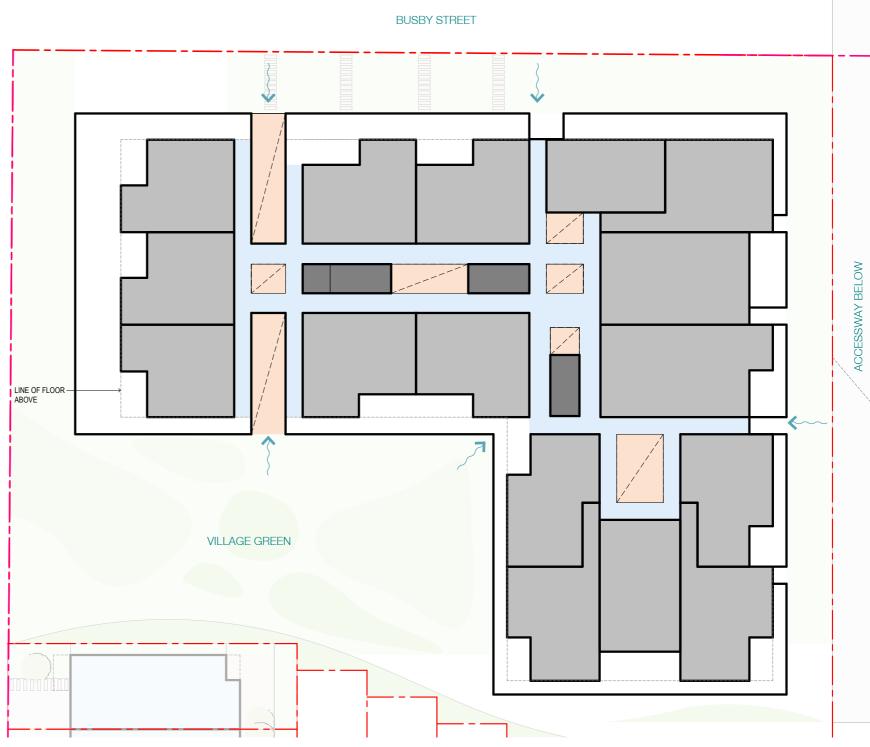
INDICATIVE CONCEPT APARTMENT LAYOUT - BREEZEWAYS FOR MAXMISED CROSS VENTILATION (NOT TO SCALE)
